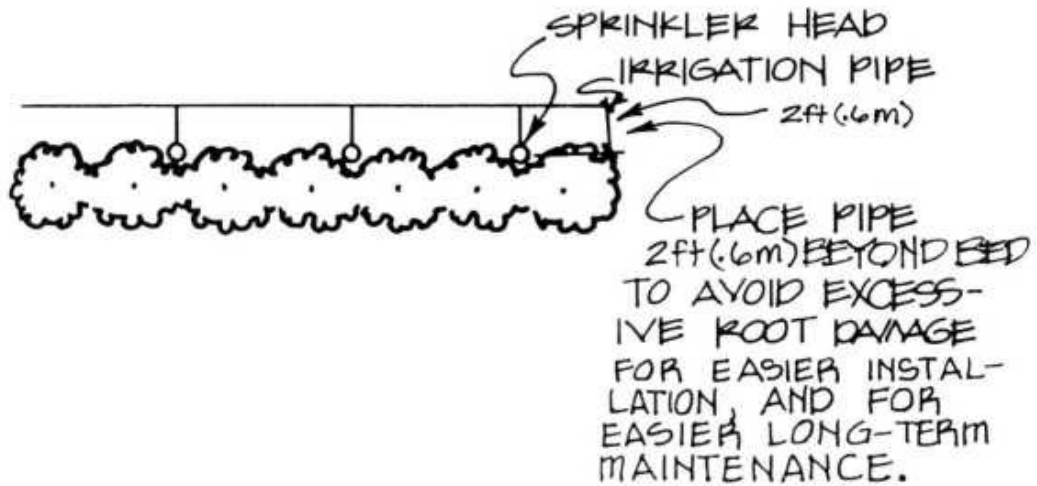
10 Shrub bed with ideal pipe layout.
